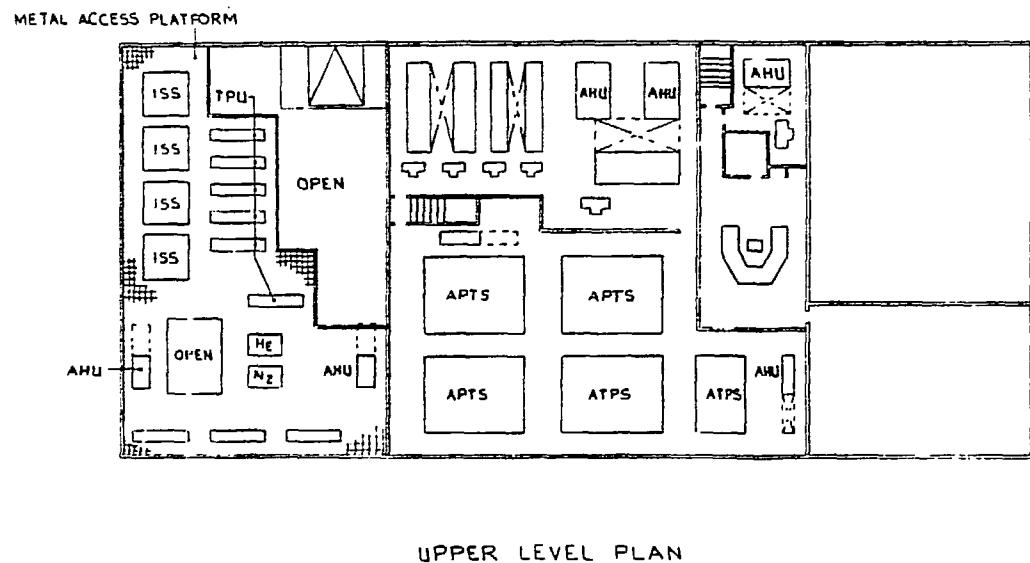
Upper Level Plan Tritium Reprocessing and Cryogenic Building
